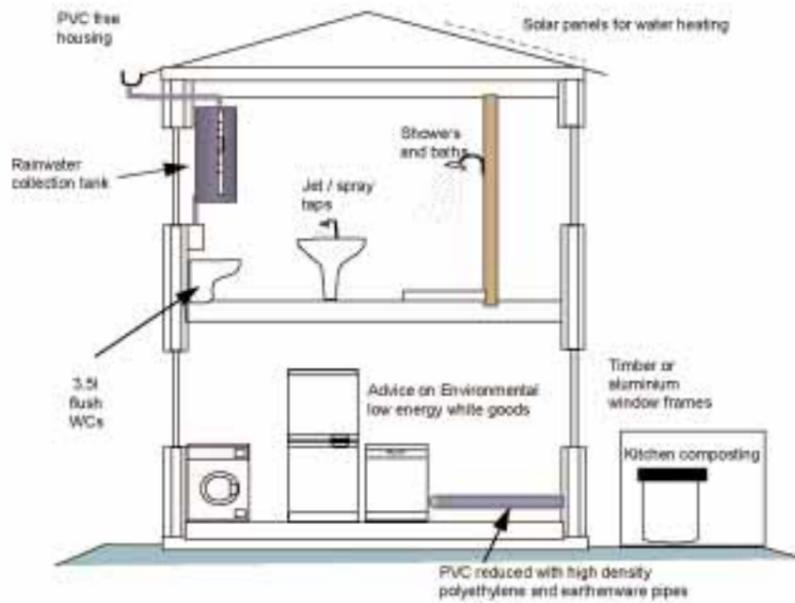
Beyond Best Practice Innovation 5% of Houses
